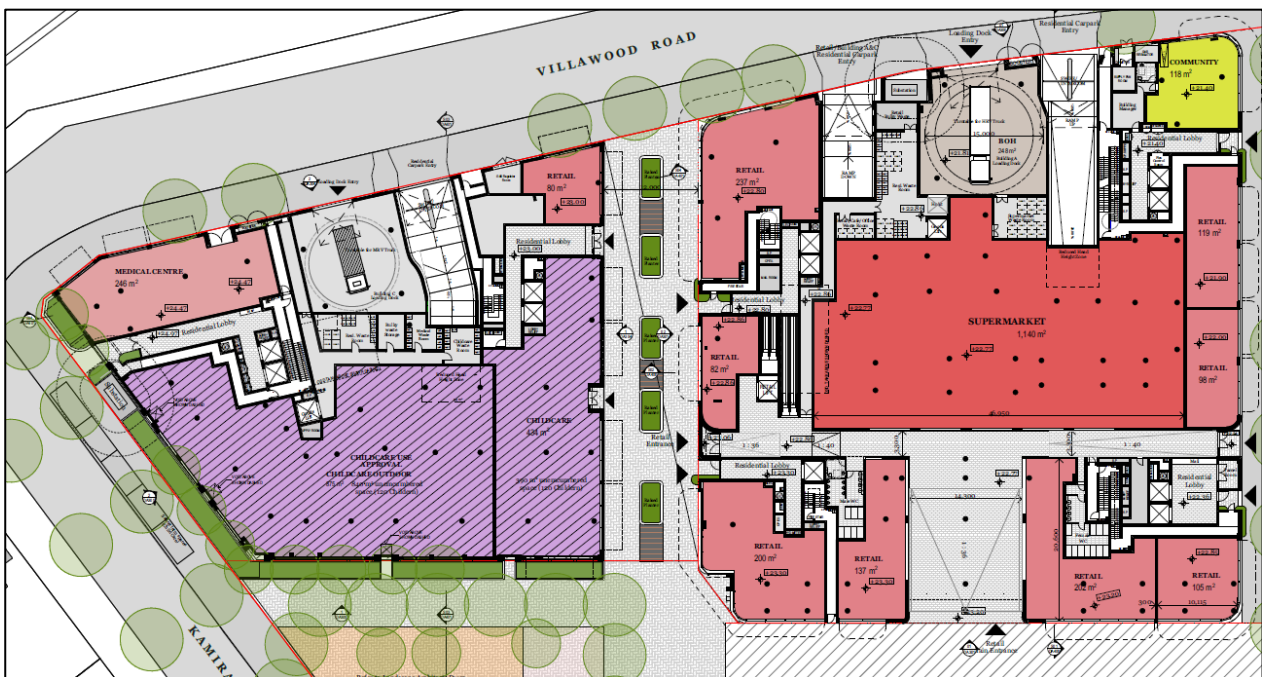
Site Layout (Ground Floor Plan – Commercial Tenancies)
